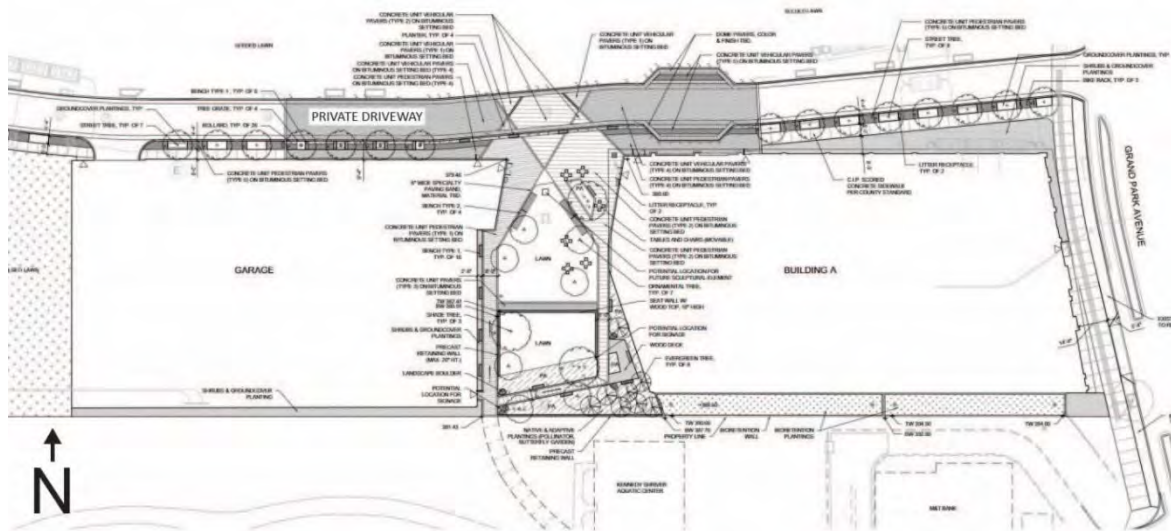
Through-block Connection Phase 1 Landscape Plan
